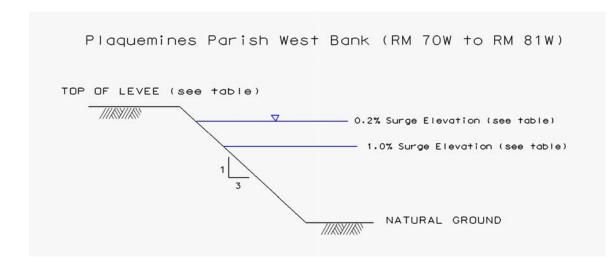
Typical Levee Design Cross-section (RM 70W-RM 80W) – Plaquemines Parish West Bank
